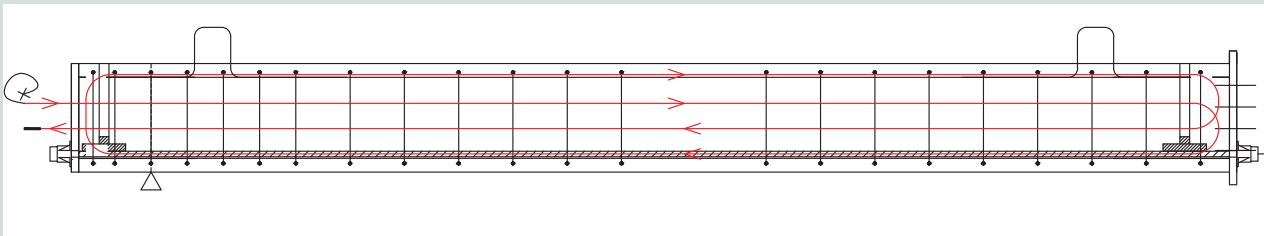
Concrete-steel beam used in testing. Note: All dimensions in millimeters. 1 mm = 0.0394 in.
